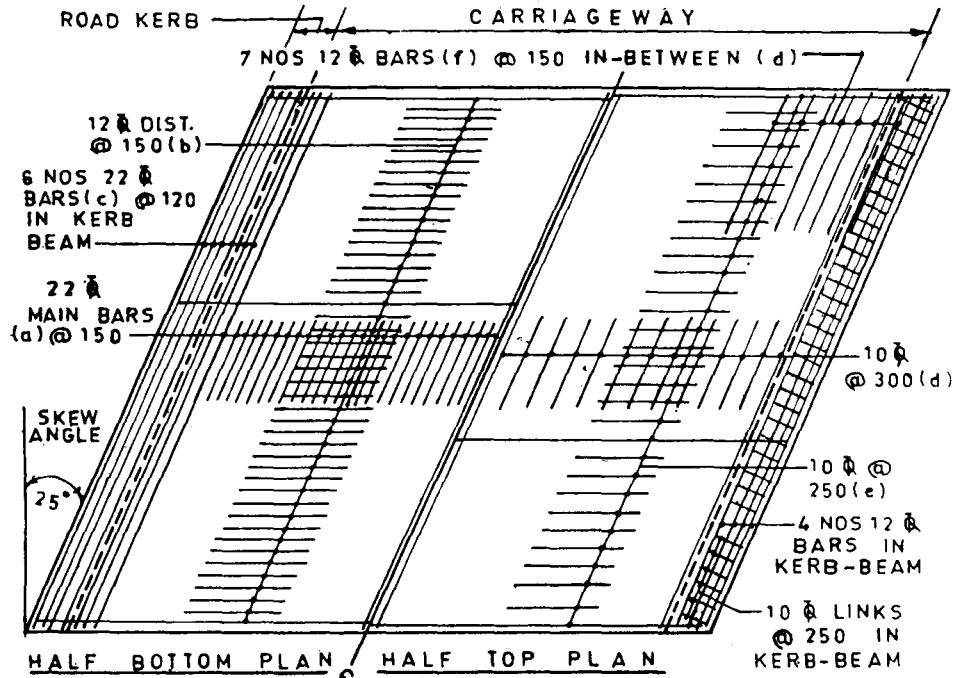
REINFORCEMENT DETAILS OF SKEW DECK SLAB
